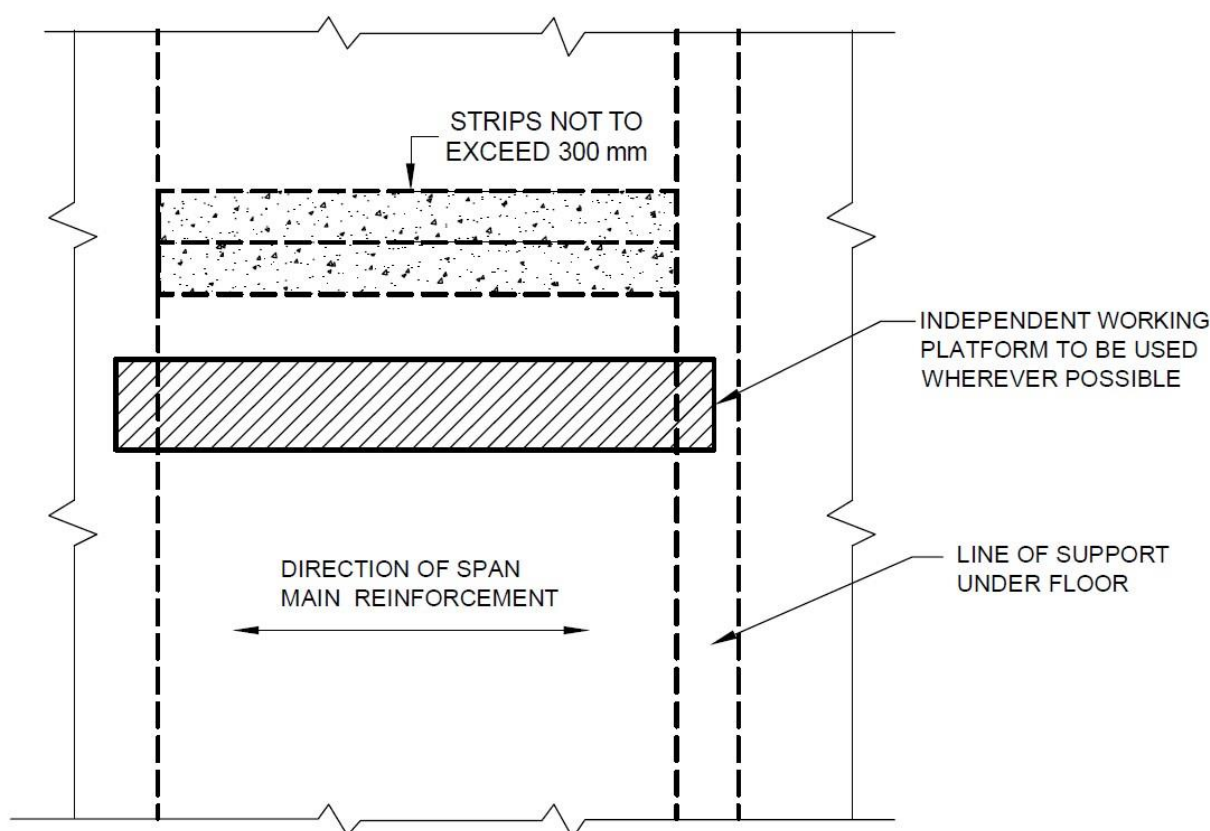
PLAN VIEW OF DEMOLITION OF REINFORCED CONCRETE FLOORS
